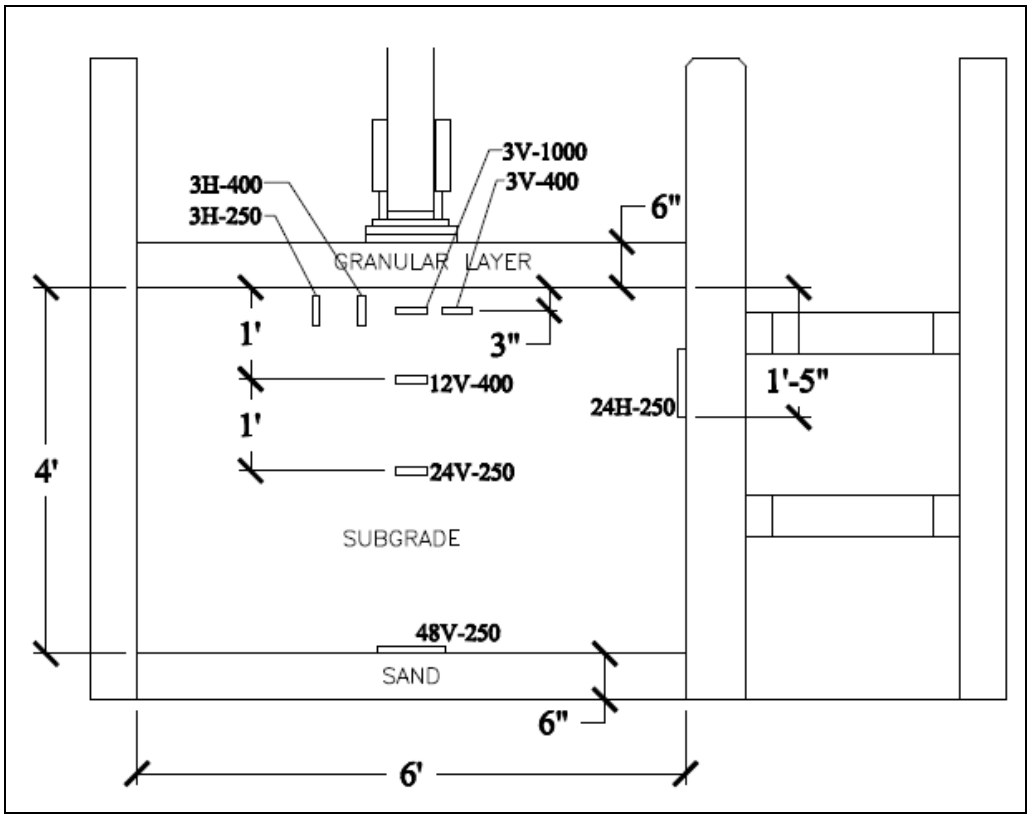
Instrumentation cross section for Test 1 (Not to Scale)
